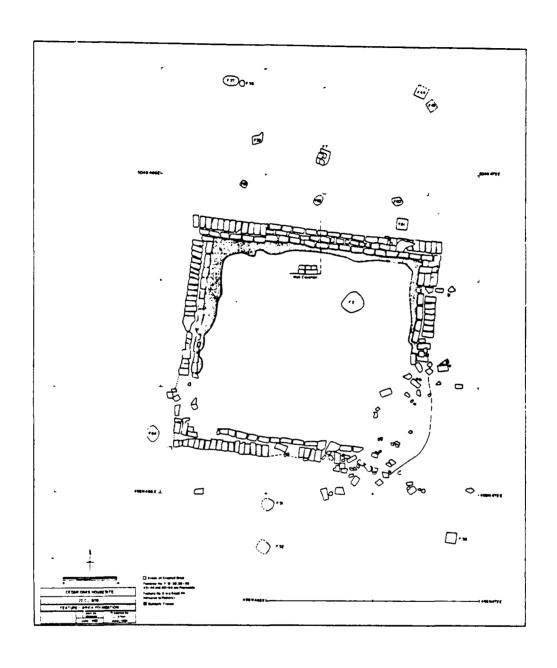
Plan View of Feature 1, Cedar Oaks House Site (22C1809).
